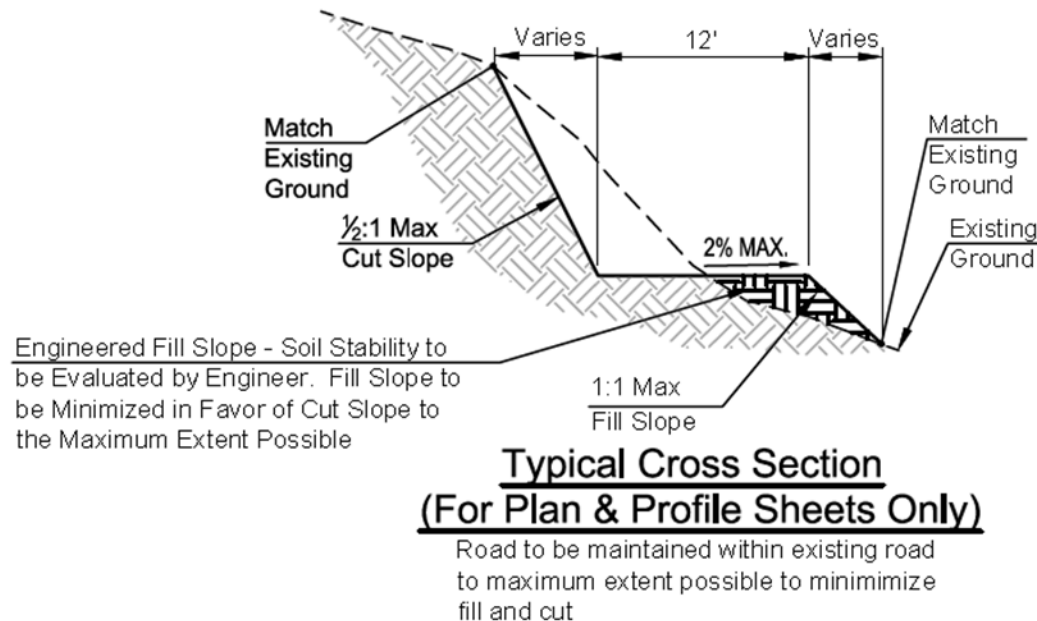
Typical Cross Section for Forest Roads and Previously Disturbed Areas to be used as Temporary Access Roads
